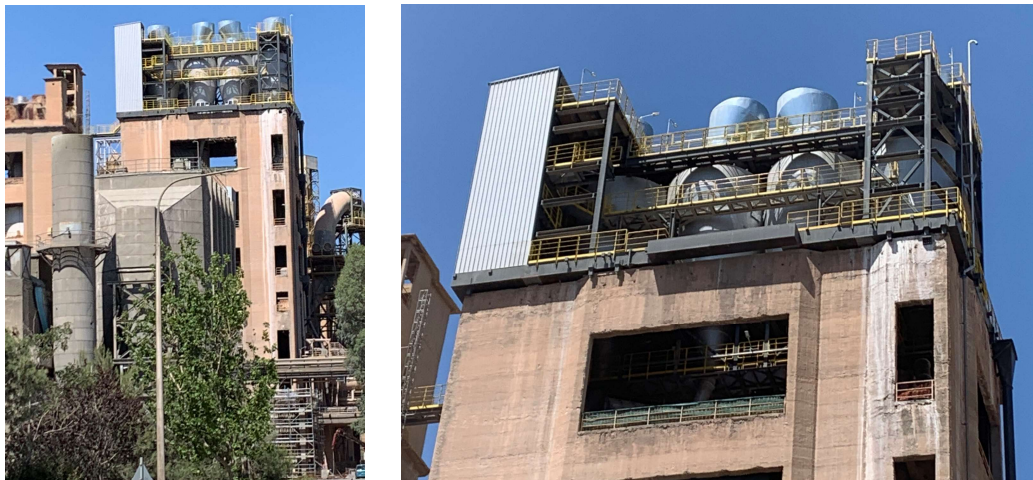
Overview of preheater building (left) and completed superstructure (right).
